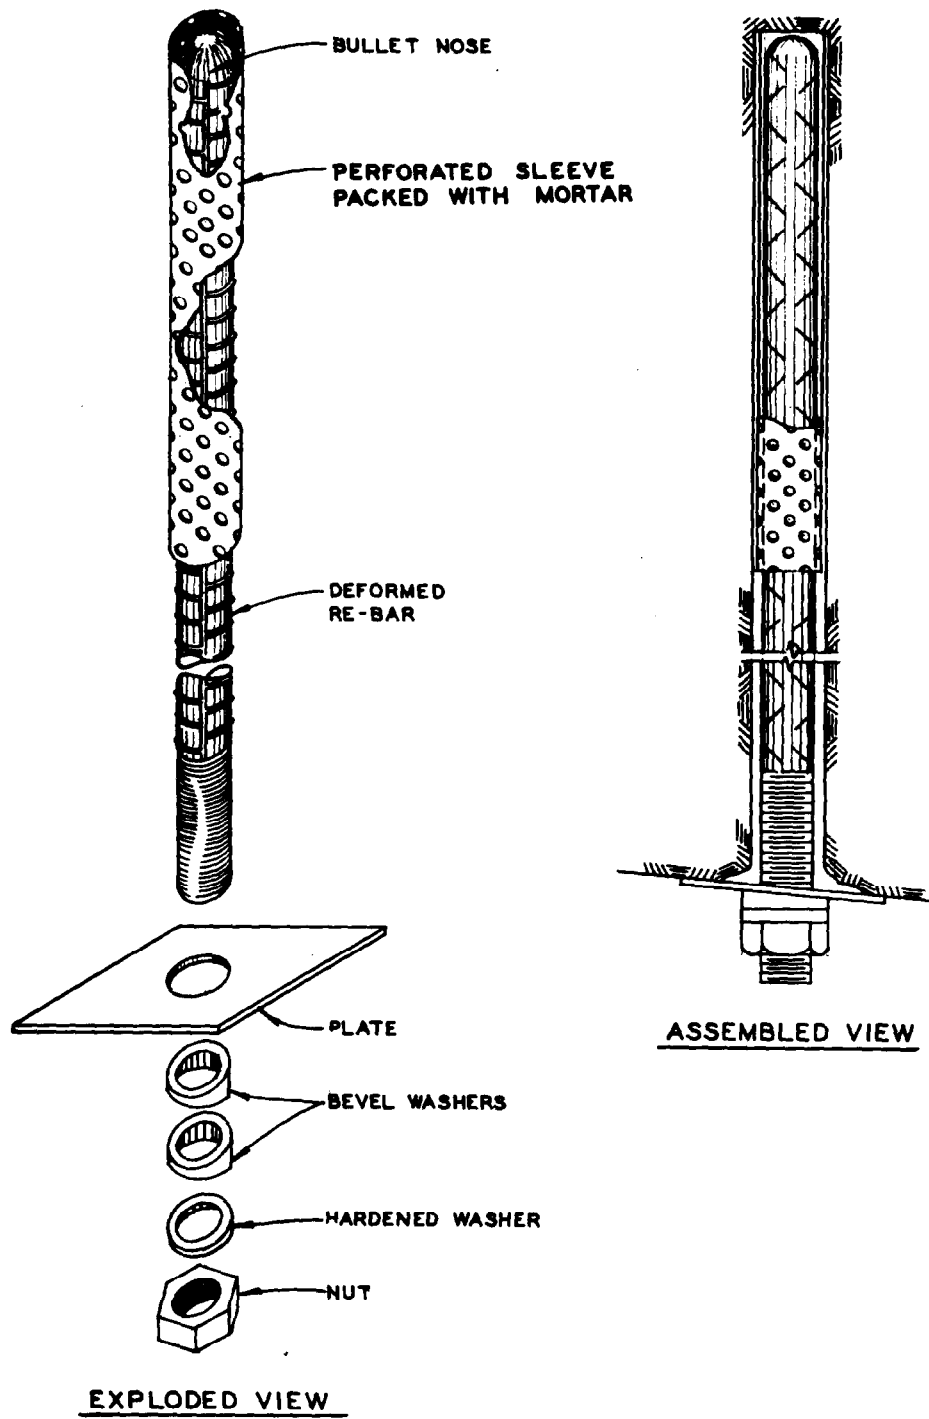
Grouted end anchorage, perforated sleeve and mortar type.
